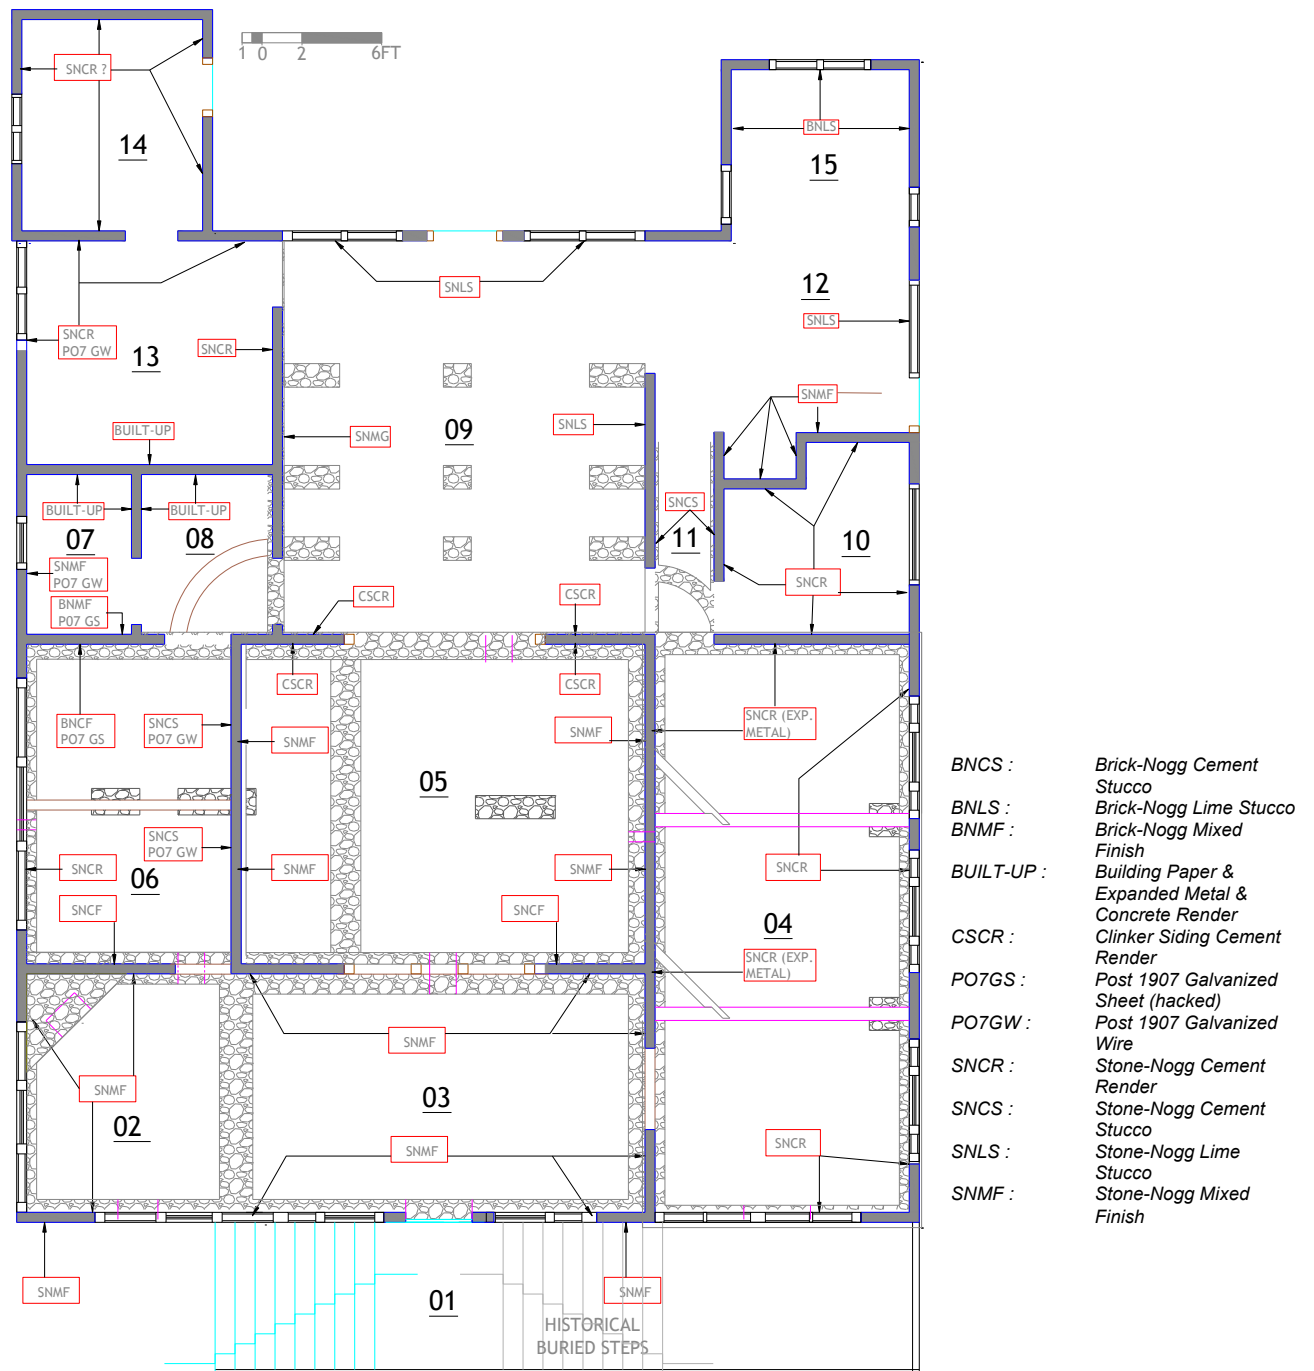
Cottage Floor Plan showing random rubble foundation walls below with eleven types of upper wall construction (©Patricia E. Green Architects 2011 August).
